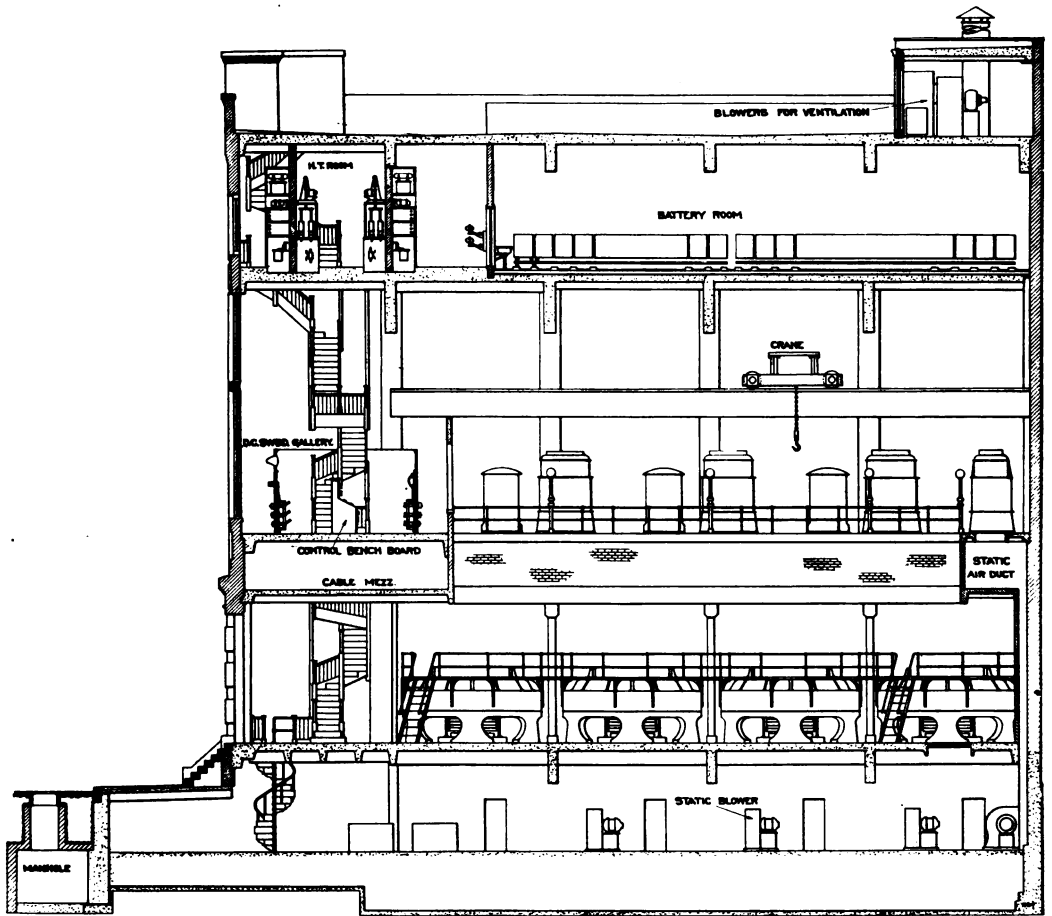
Longitudinal Section, Sixteenth Street Substation.
